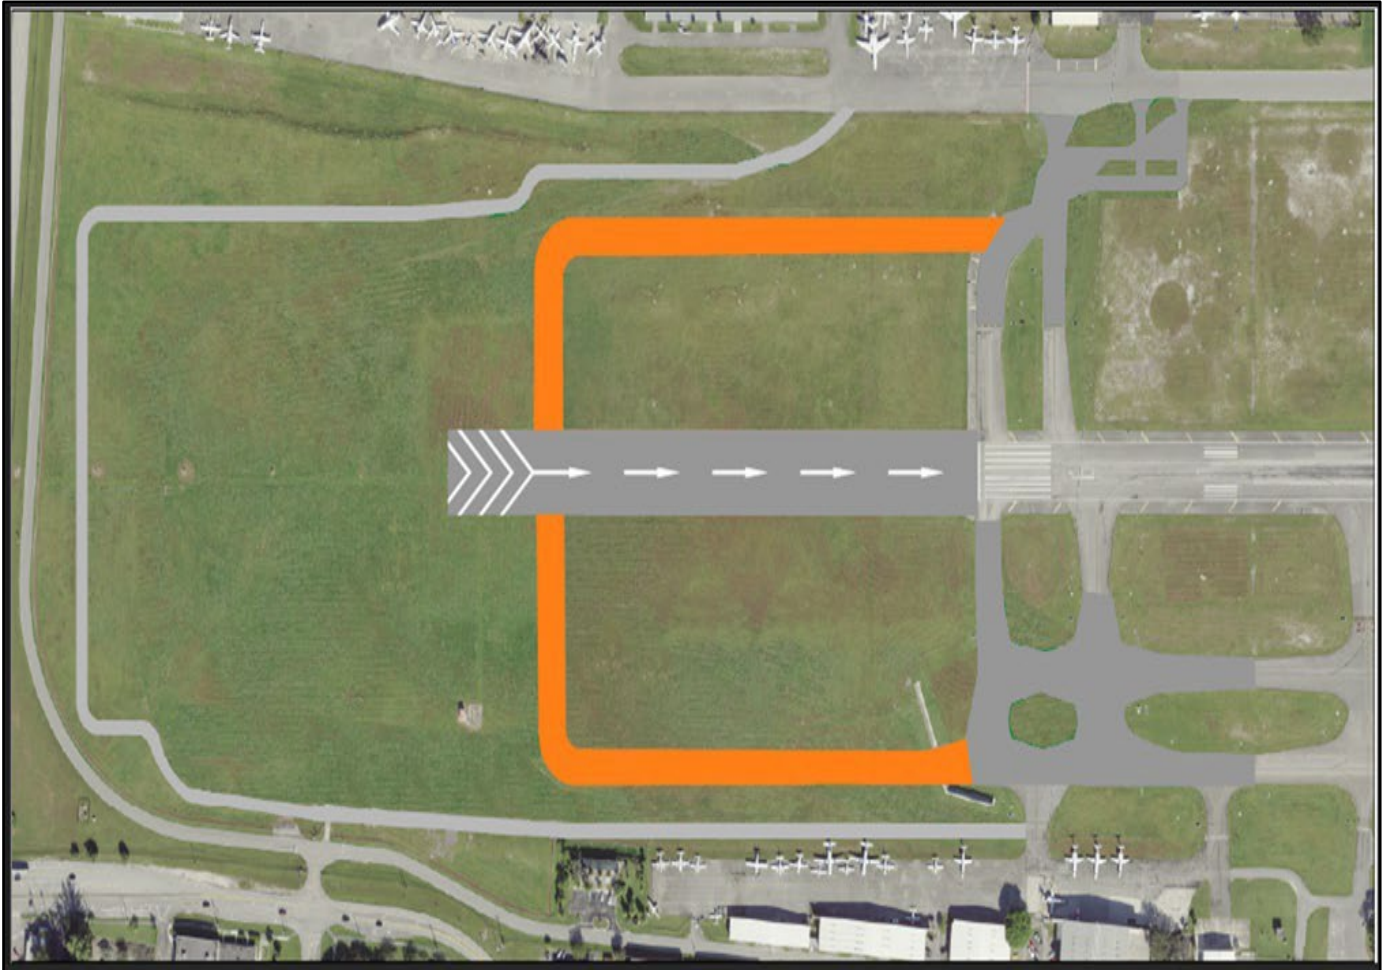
Parallel Taxiways Echo (South) and Foxtrot (North) Providing Access to the Proposed Western Runway Extension
